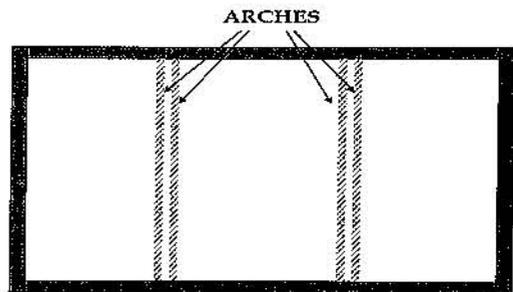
Twin Half Split vertically separated bamboo parabolic tied arches with concrete infill
